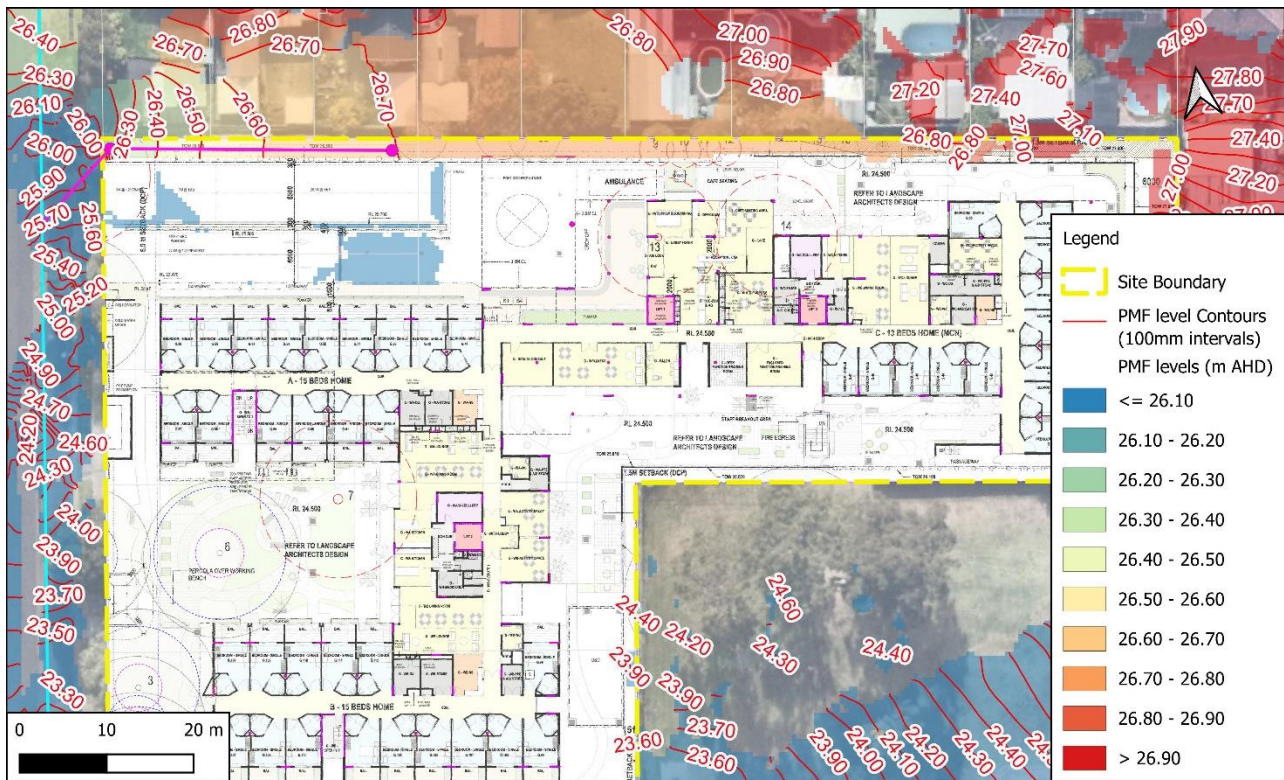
PMF Levels Adjacent to Proposed Retaining Wall at Northern Site Boundary
